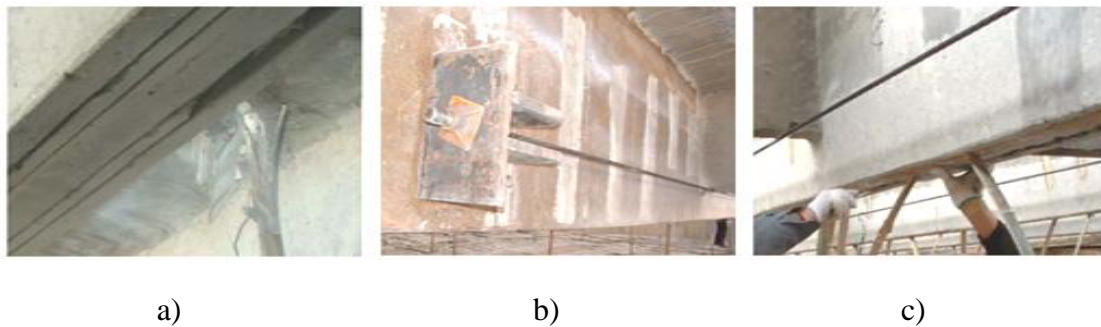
Steps during strengthening: a) Cutting the groove, b) compressing the beam, c) Grouting and embedding of FRP rods. (Wang et al., 2009)
